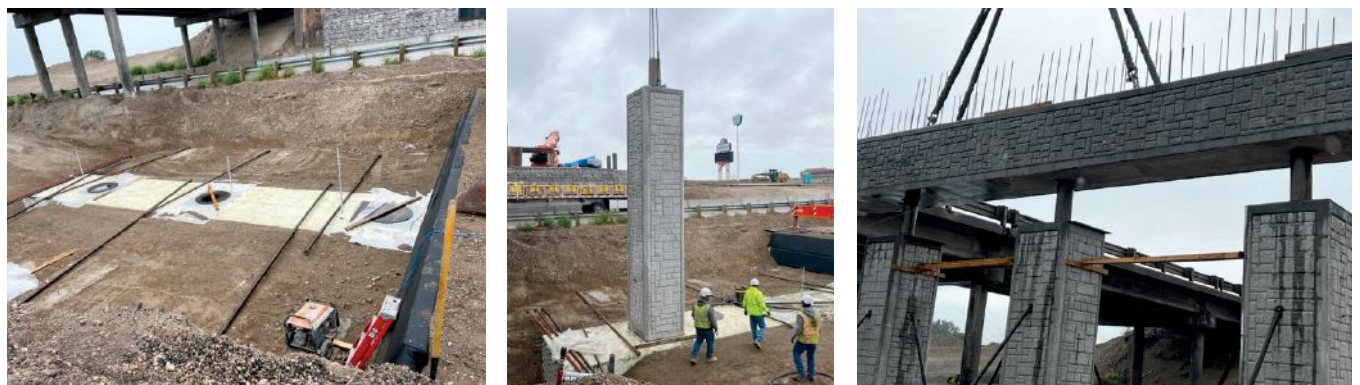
Construction of the Fort Hall Interchange Bridge over Interstate 15 in southeast Idaho. This project introduced seismically resilient precast concrete pier-element connections developed by Idaho State University and the Idaho Transportation Department.
